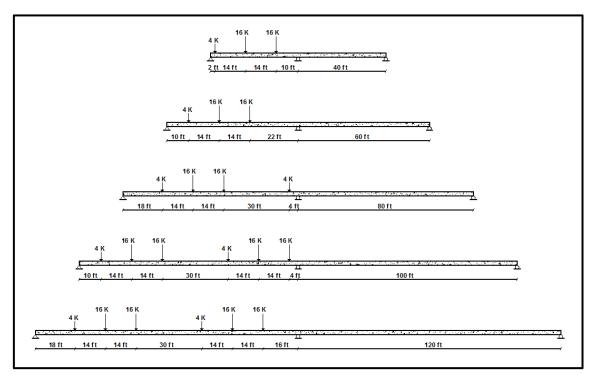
Longitudinal Beam Section of a Two-Equal-Spans Bridge and Critical Position of HS20 Trucks That Produce the Maximum Positive Moment for the Five Different Span Lengths
